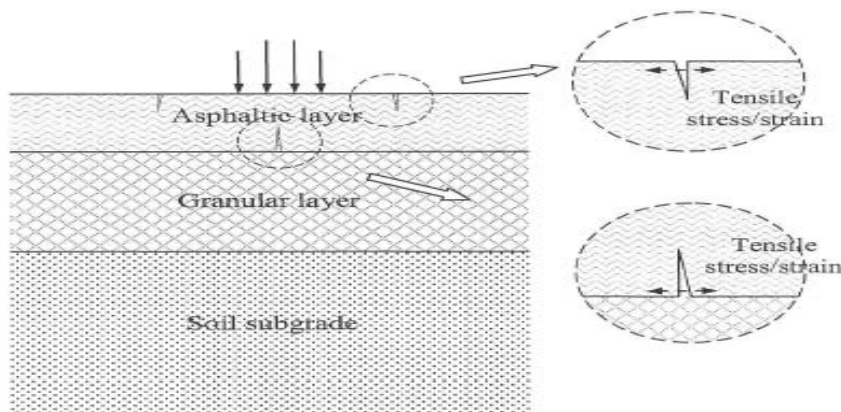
Fatigue cracking in road pavements outside and bottom of loaded area (Wang, 2011)
